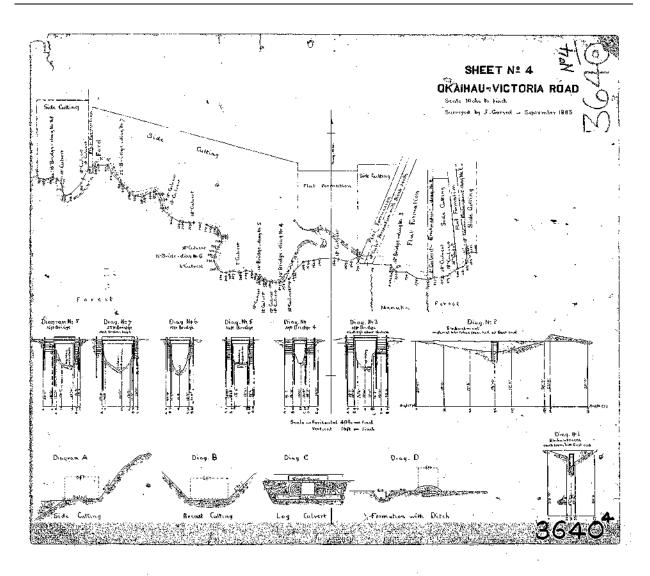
SO 3640/4 Okaihau-Victoria Valley Road. J. Garsed, 1883. This plan shows exemplary elevations road formation and structures which do not appear to have been built before 1900.
